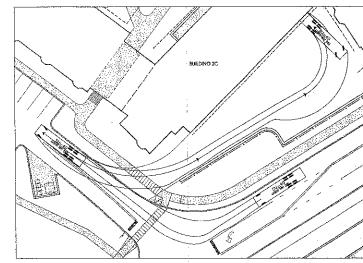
BUILDING 2C CENTRAL UTILITY PLANT ACCESS (BOX TRUCK)
